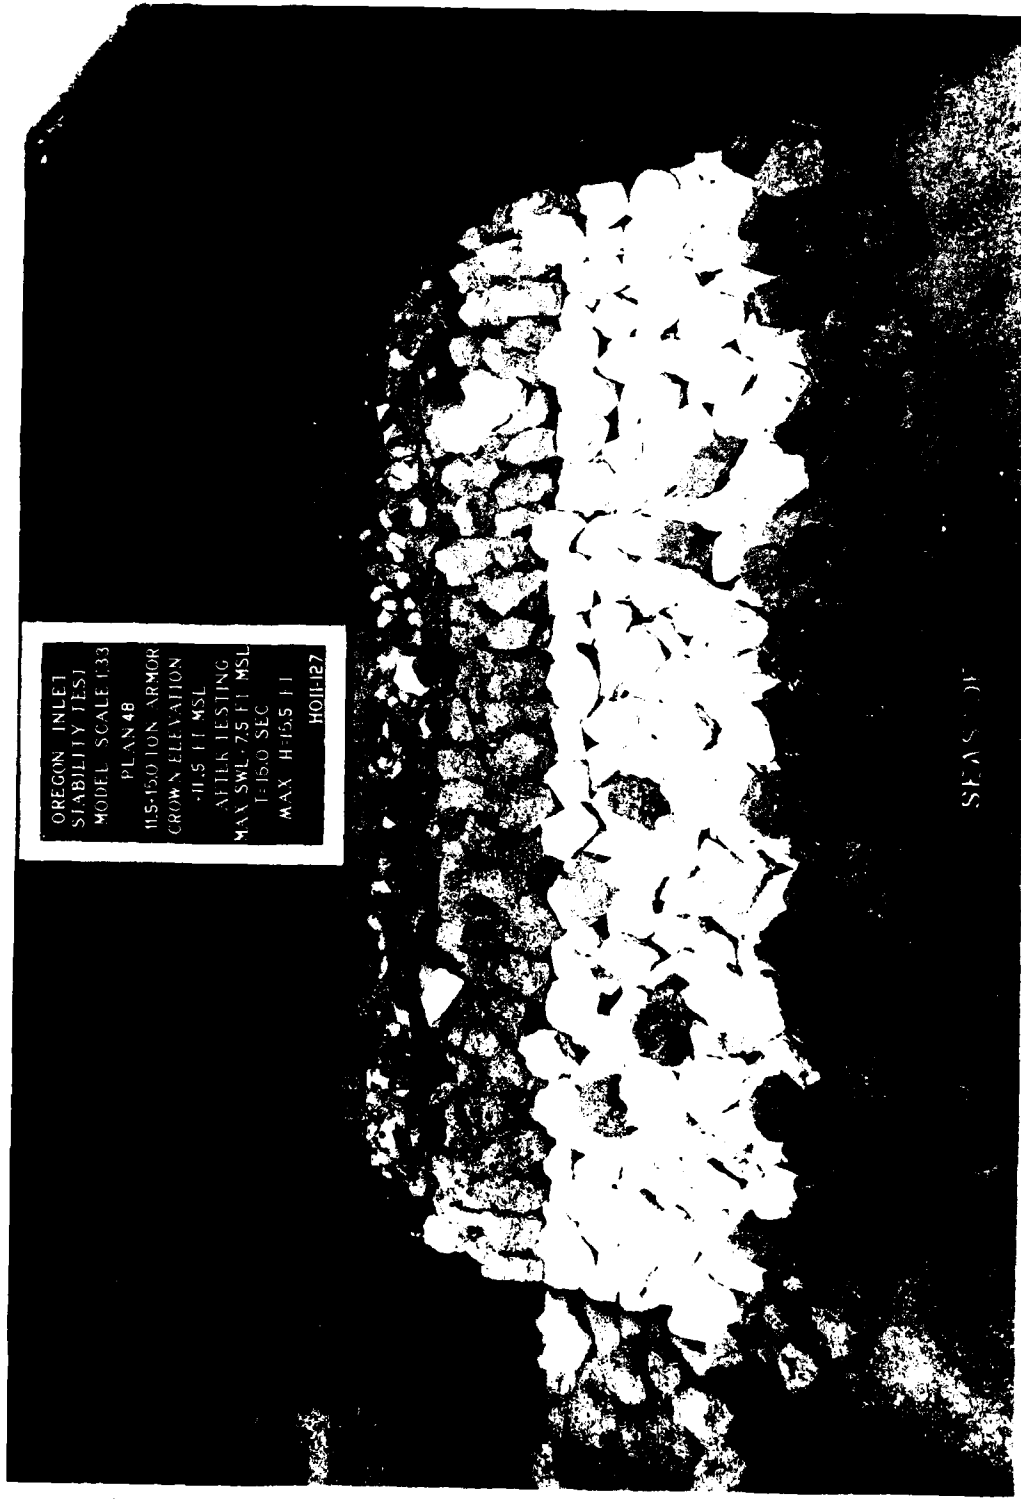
Sea-side view of Plan 4B after testing step 5 of the +7.5 ft NGVD hydrograph
